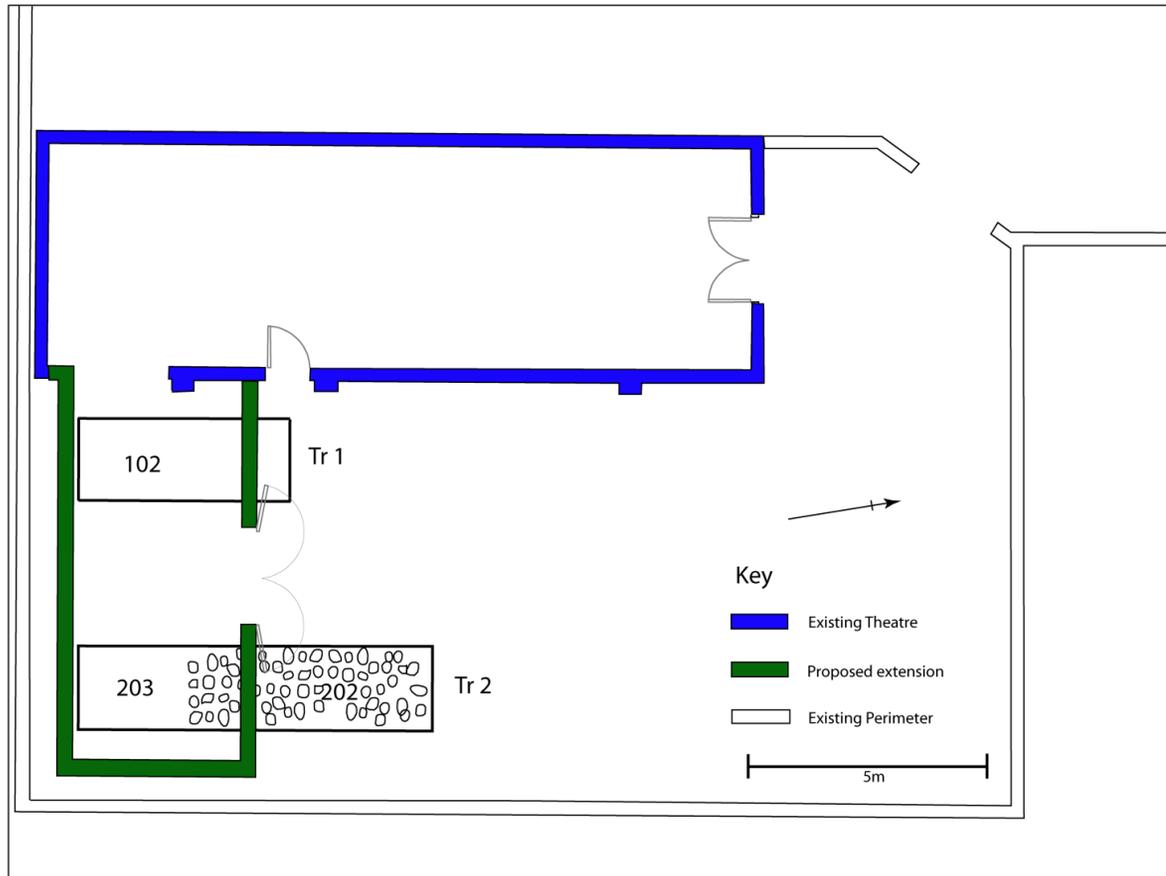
Plan of theatre and proposed extension showing initial Test Trenches.
